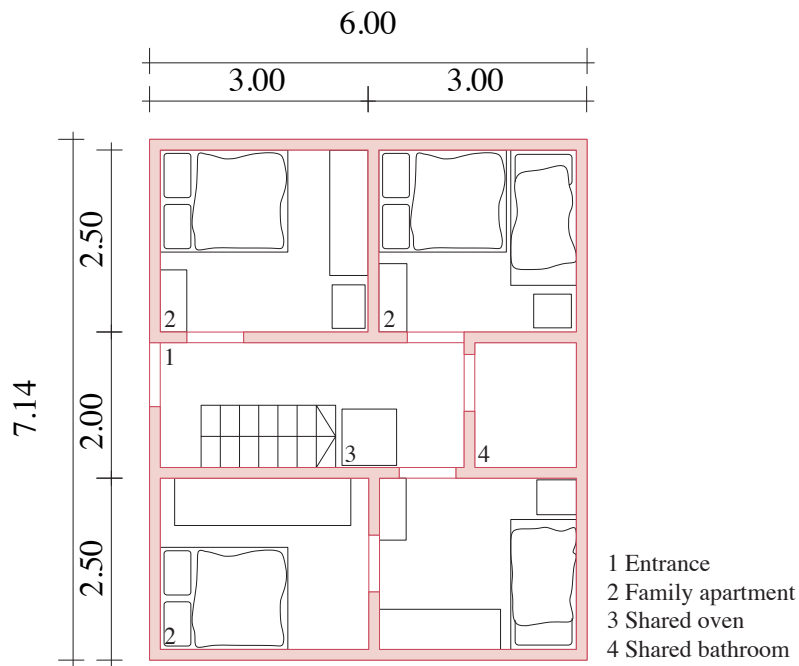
Ezbet Abu Qarn - Typical Floor Plan
